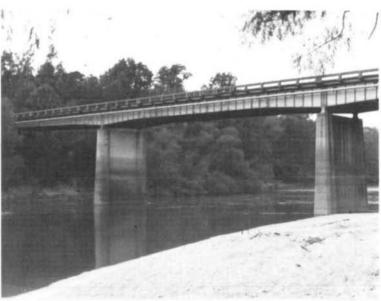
U. S. 378 HIGHWAY BRIDGE (R.M. 69.4)
